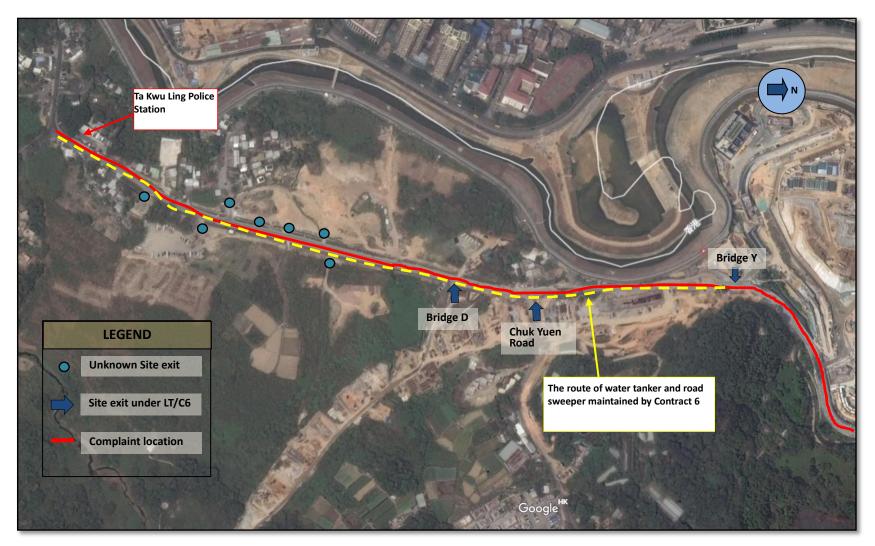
The site exits along Lin Ma Hang Road under Contract 6
